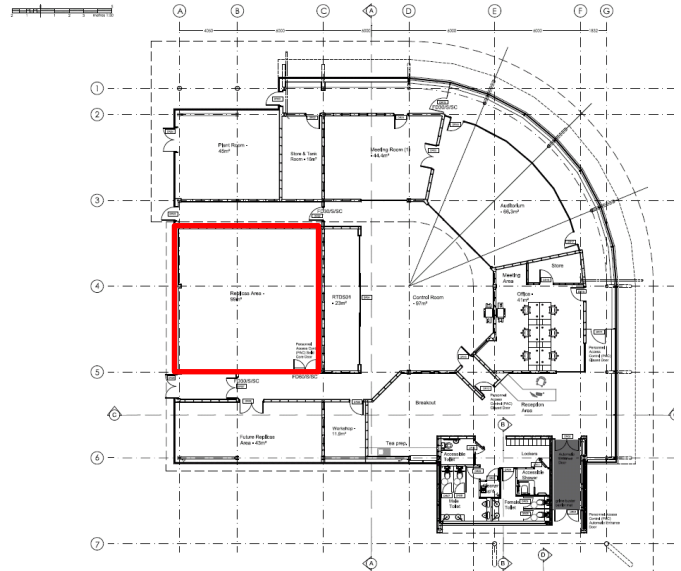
Plan of the HVDC Centre (replica room highlighted)
